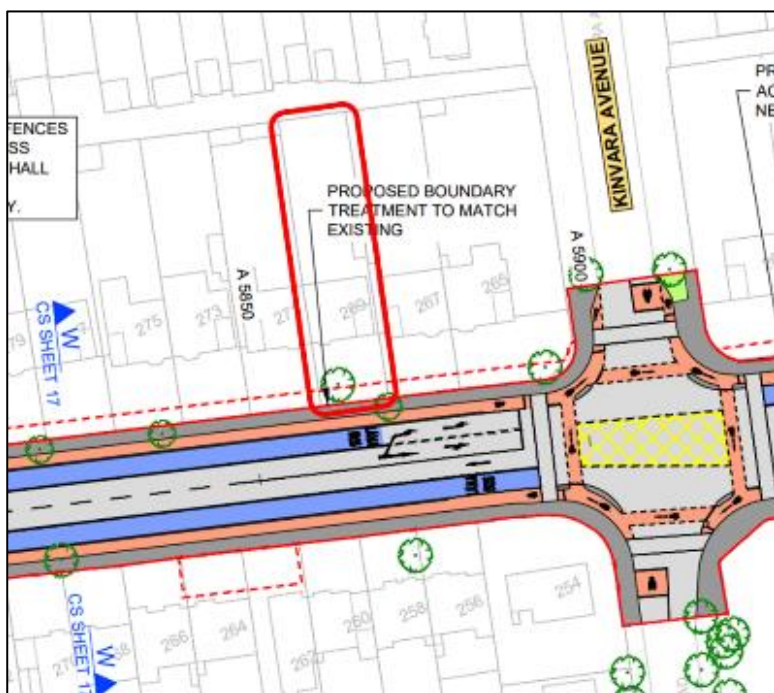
Proposed new Layout at 269 Navan Road
